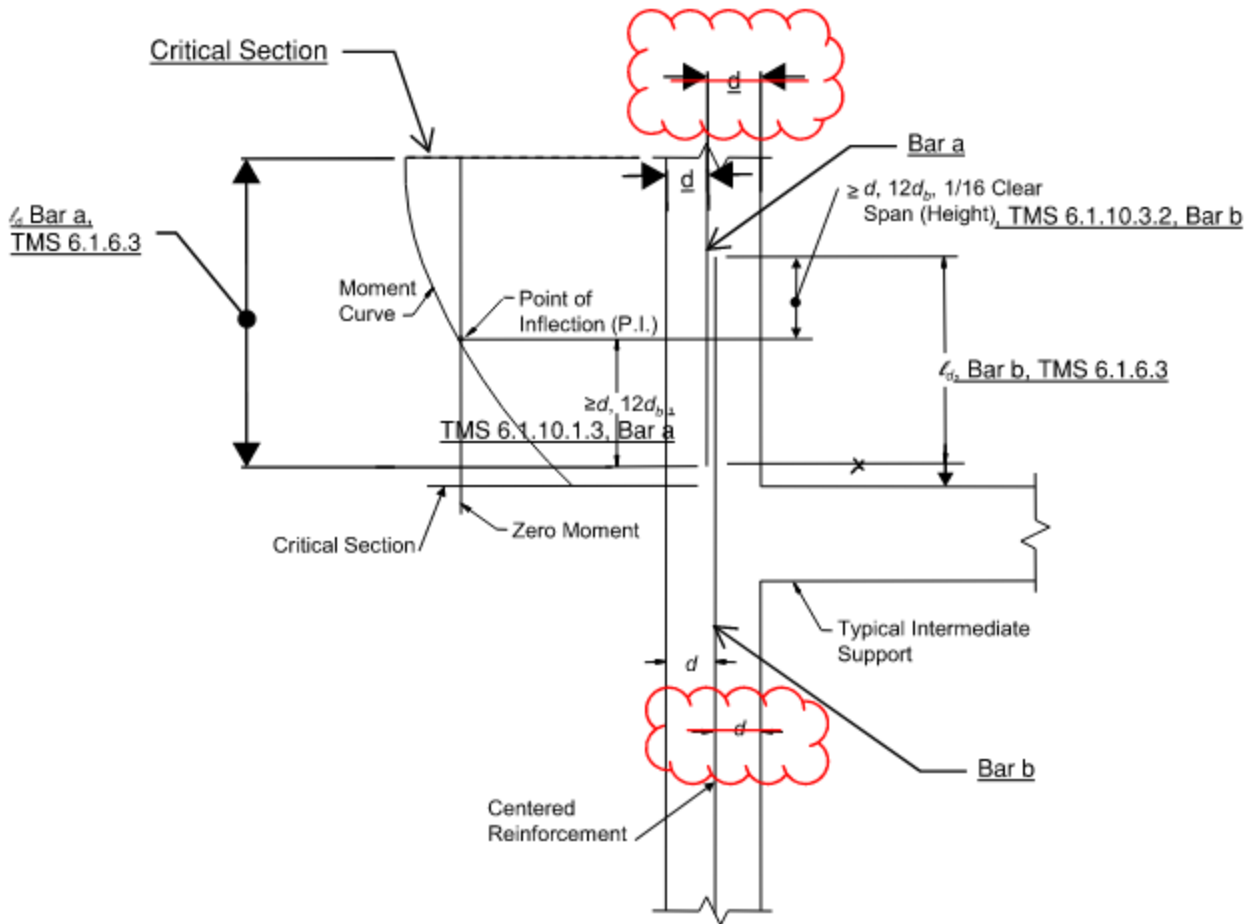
Development of flexural reinforcement in a continuous wall with centered reinforcement
